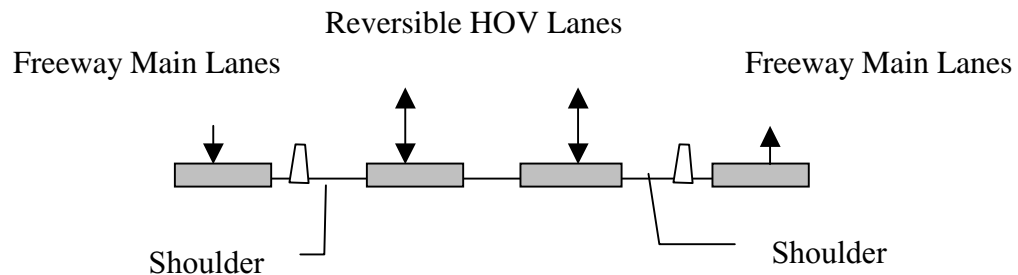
Cross Section of Exclusive HOV Facility with Freeway ROW
